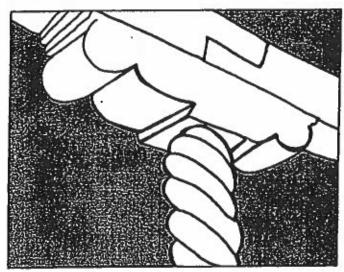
(above): Spanish/Pueblo Revival Style architectural detailing, including portal, canales and exposed vigas.
